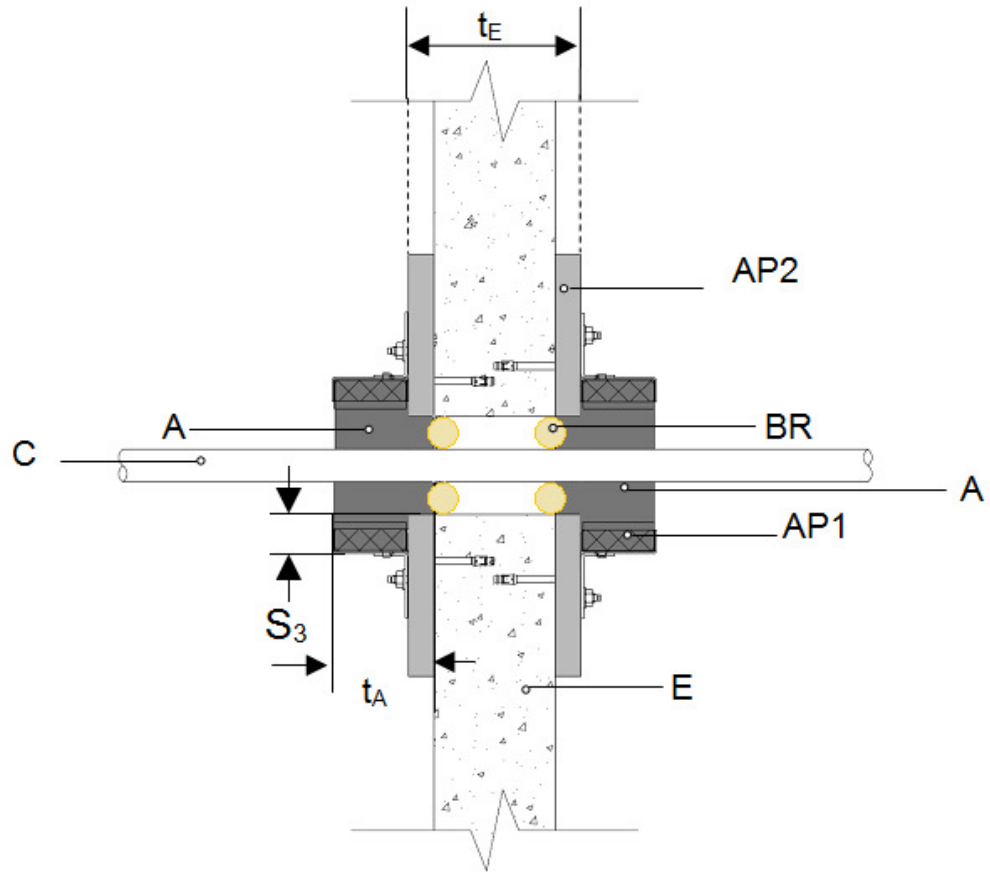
Details for PE-X Pipes in 75mm rigid wall with additional protection AP1 + AP2.
